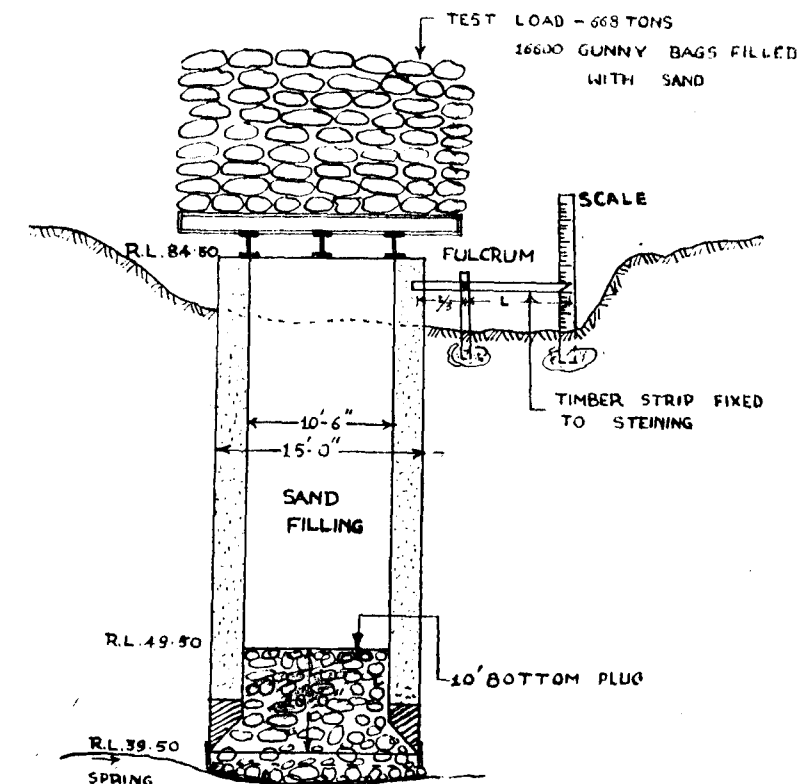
Budhara bridge, testing of wells at pier No. 3
